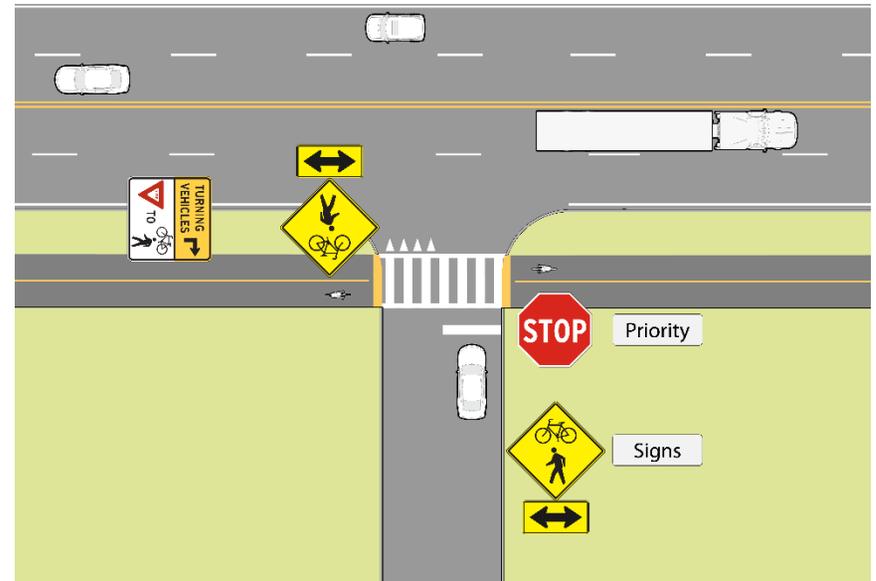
Tier I facility - driveway intersection (low usage) treatment
